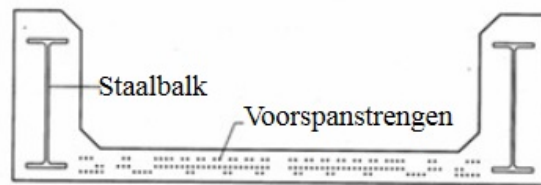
Cross-sectional view of a typical trough girder [FEBE, 2013]
